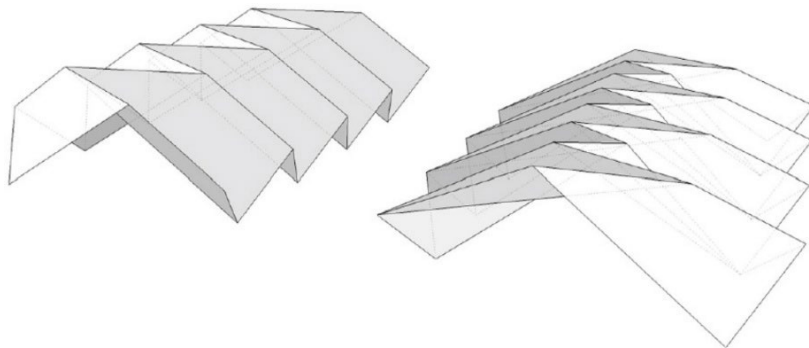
folded plate structures made of glass laminates using a new connection detail. Source: Marinitsch, S., Schranz, C., & Teich, M. (2016). Folded plate structures made of glass laminates: a proposal for the structural assessment. *Glass Structures & Engineering*, (2), 451–460. <https://doi:10.1007/s40940-01500021>
